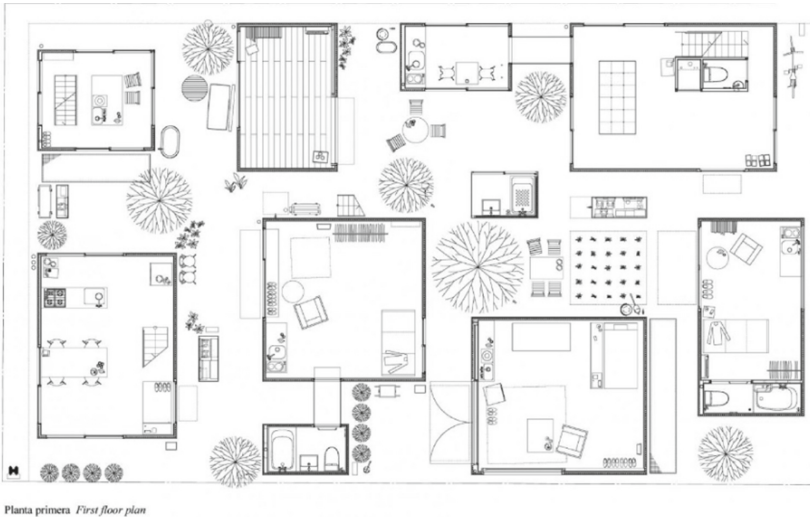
The site plan and floor plan of Moriyama House, by Ryue Nishizawa, Tokyo, 2005. [<https://arquitecturaviva.com/works/casa-moriyama-tokio-3>]
